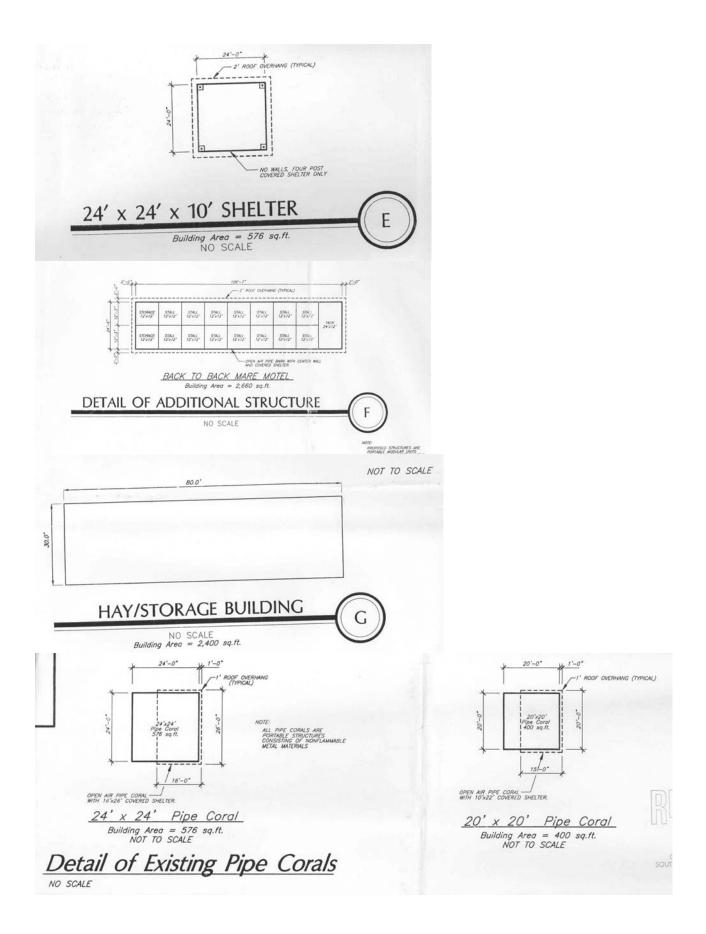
CDPA No. 4-02-131 Proposed Structure Details (2 pages)
